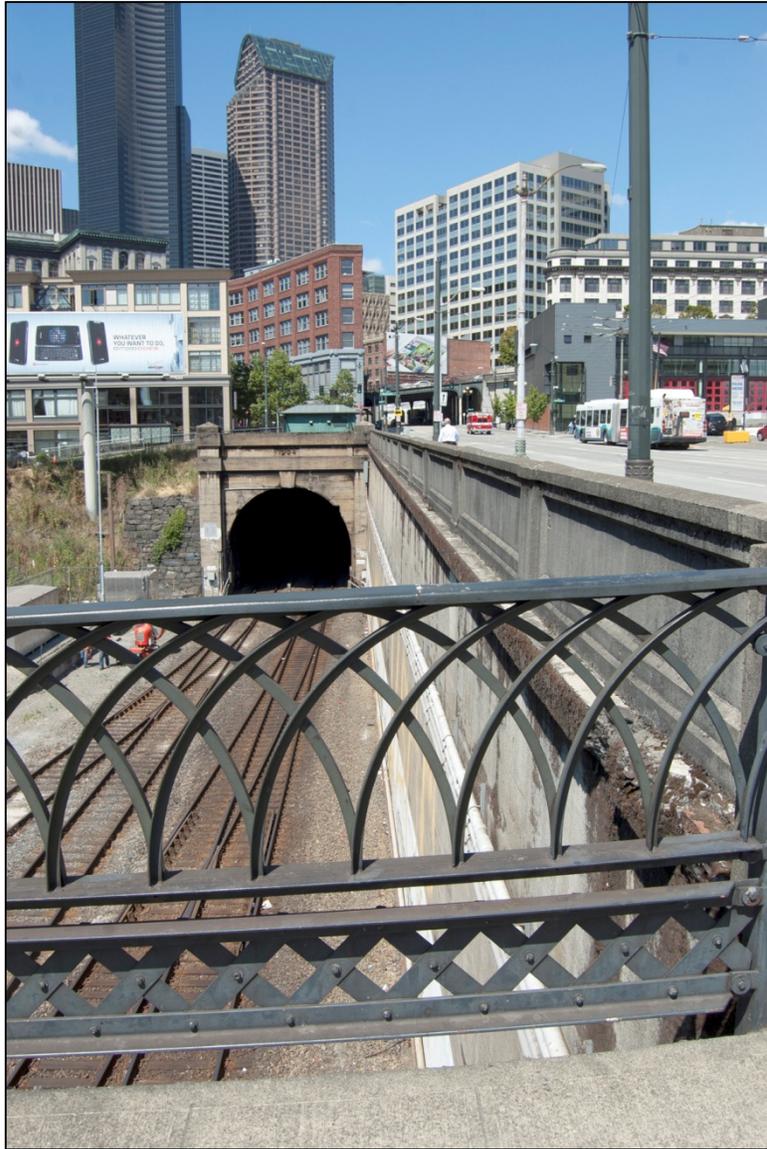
Bridge rail at South Main Street with Great Northern Railway tunnel portal and Yesler Bridge in background; view to the north.
